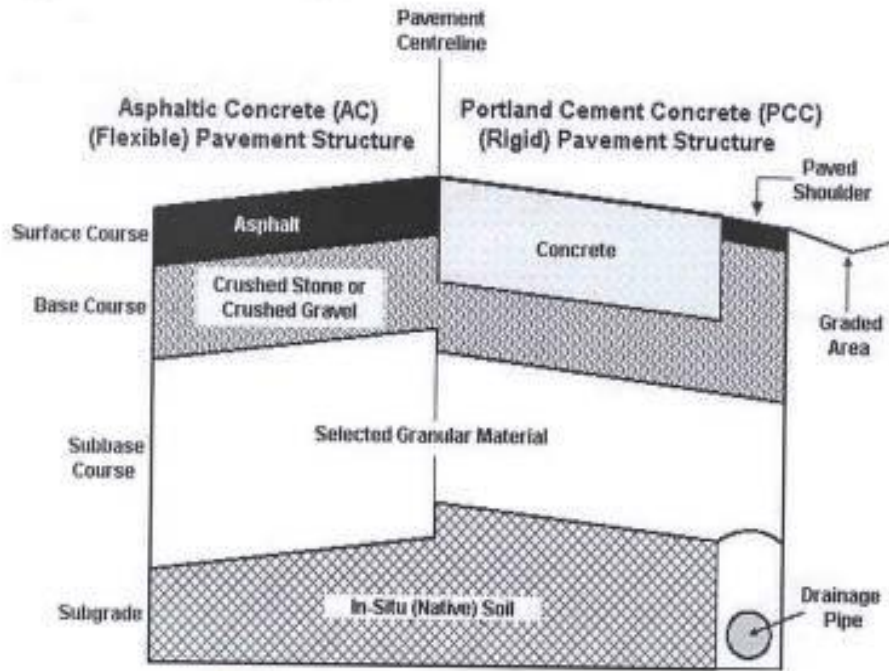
Cross section of typical pavement (after Chew et al. 2009)
